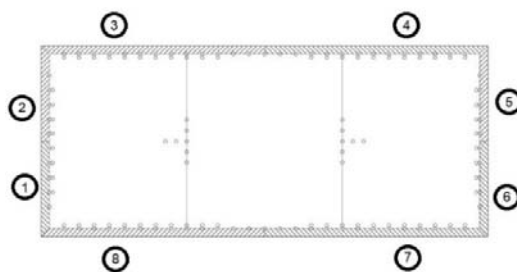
Division of cover concrete in the pier section of Shahid Bakri Bridge
